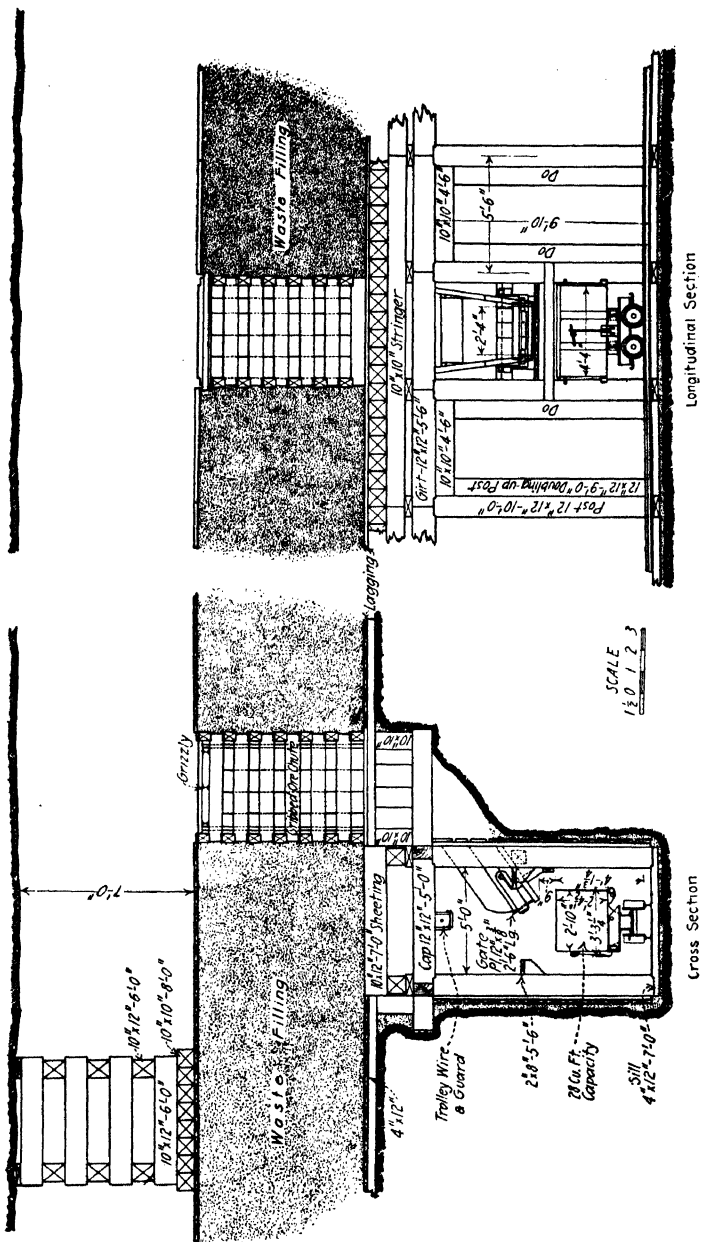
CHUTE AND GANGWAY TIMBERING.
